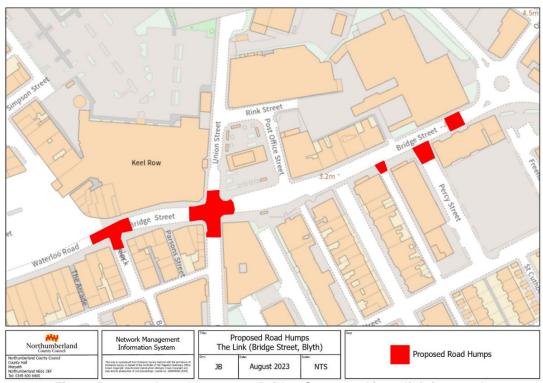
Proposed road humps at Bridge Street and its adjoining roads
